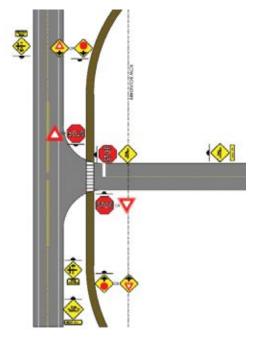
Example Signage Plan for Trail Tying into Roadway Bridge (Alberta Transportation)
